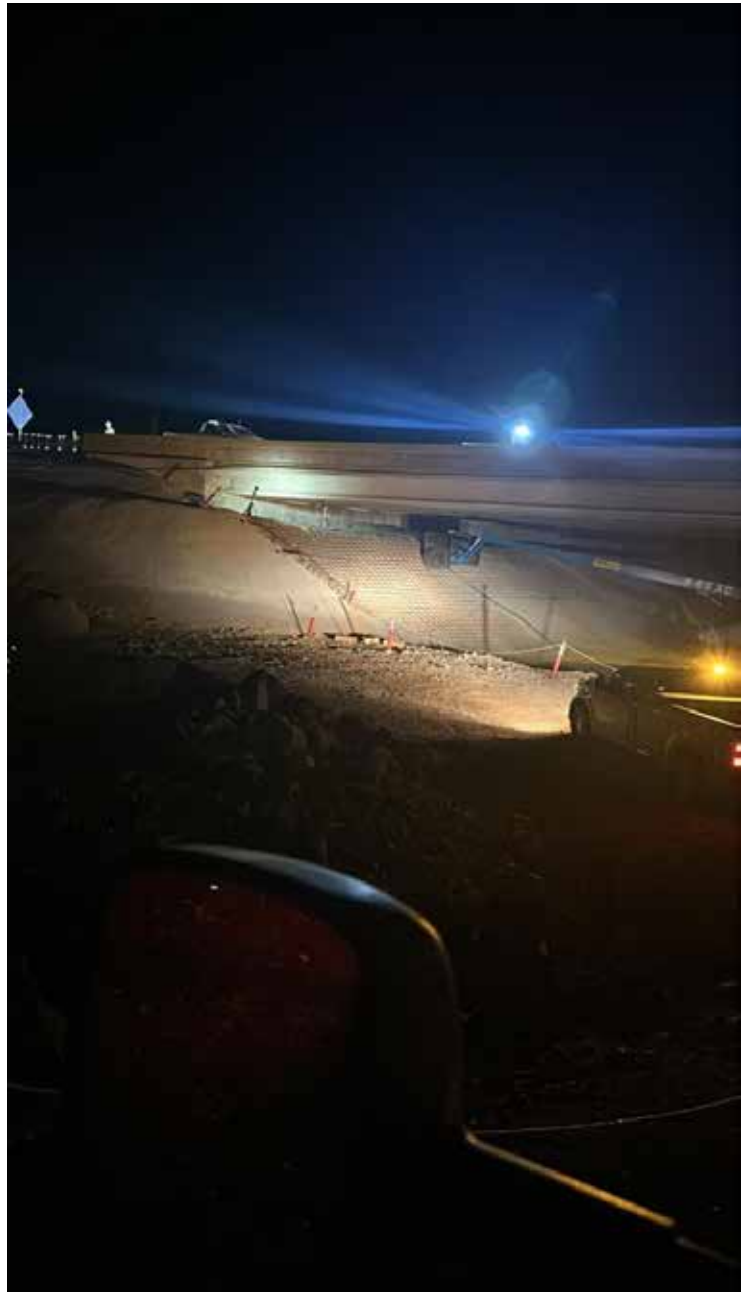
Night shotcrete application under a bridge for slope stabilization and erosion control project
